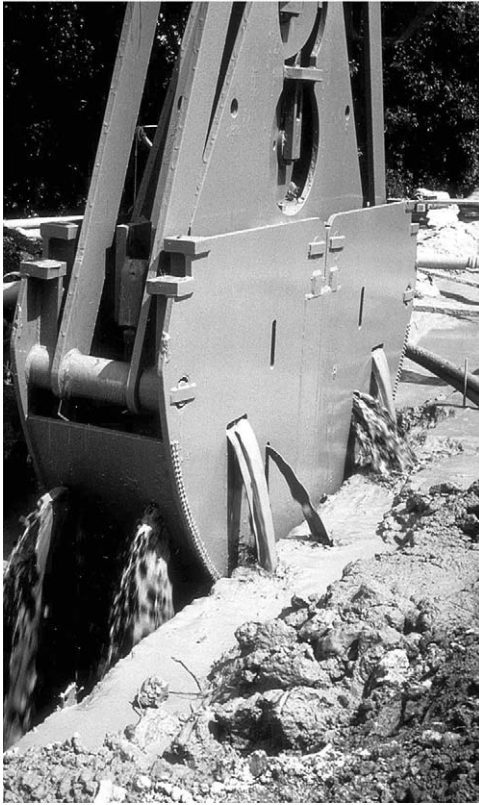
Diaphragma walling. Excavation of a trench and its subsequent lining with a thixotropic bentonite slurry.
